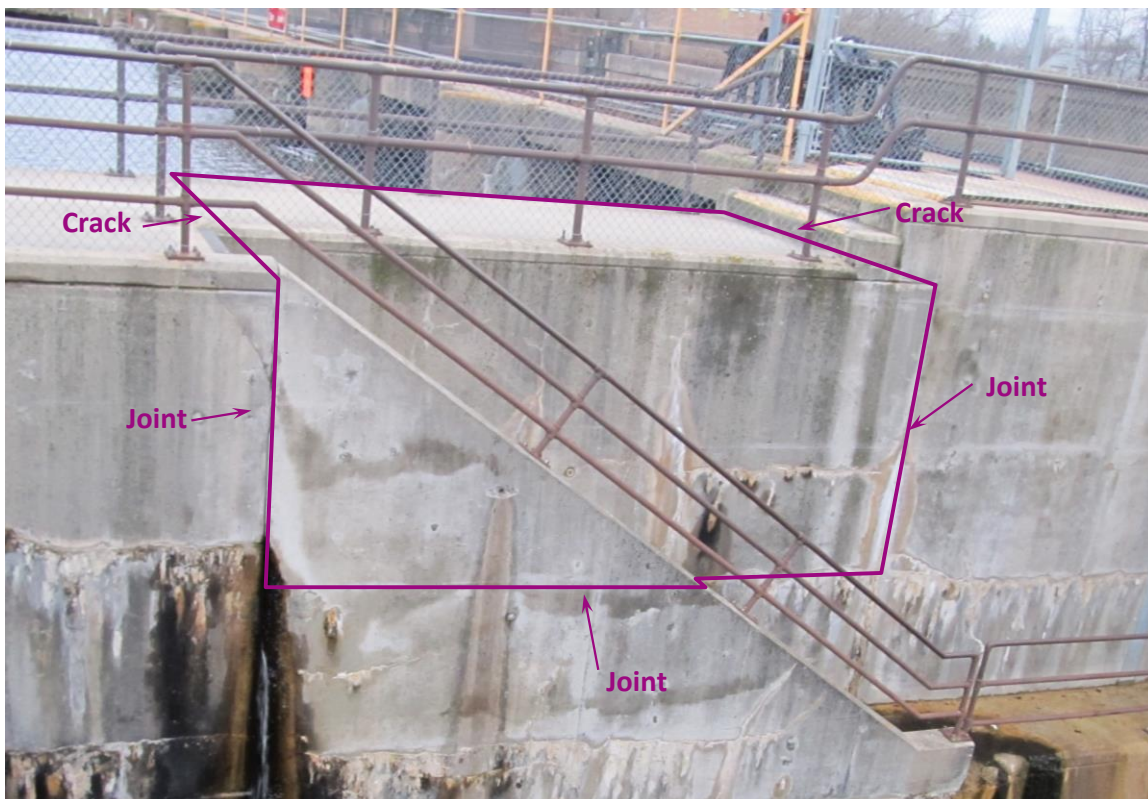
System of cracks and joints at the top of the stairs
